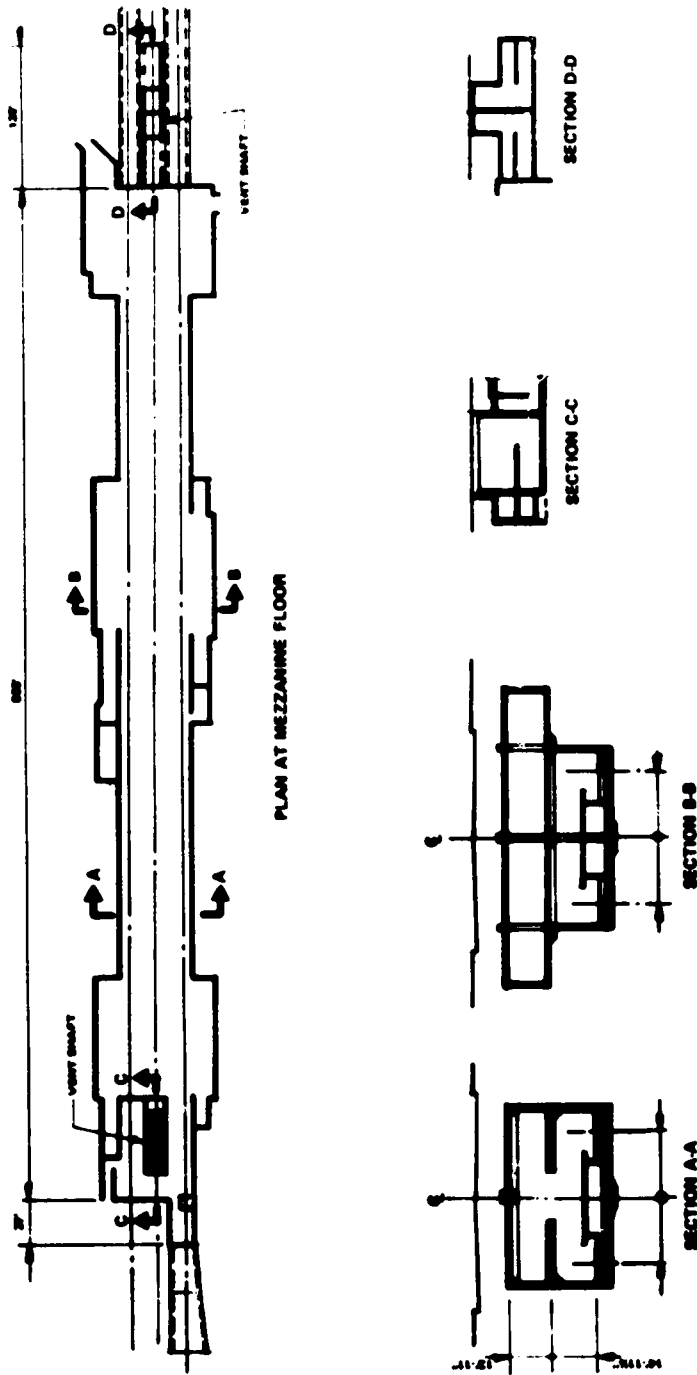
Plan and Elevation for the Model Station Similar in Size and Layout to the K0016 Station of the BART System
